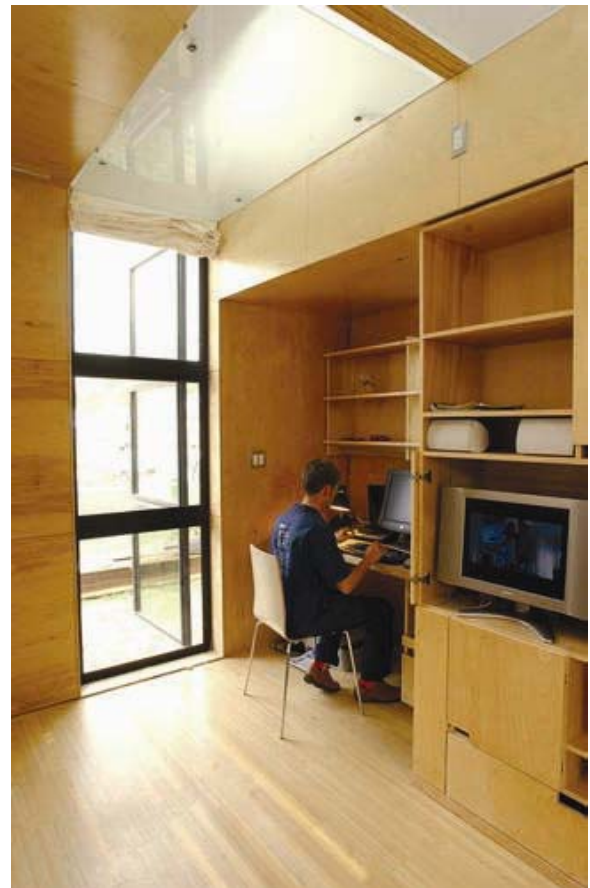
Bamboo Flooring Photo Courtesy: SoundSuckers (permission not requested)
